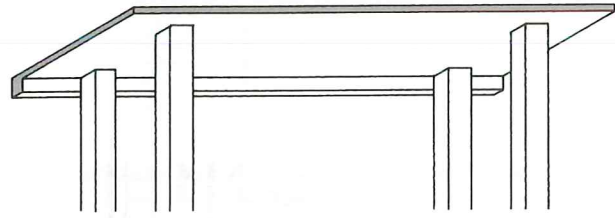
A flat plate roof utilizes a two-way reinforced concrete framing system. It has a slab of uniform thickness.
